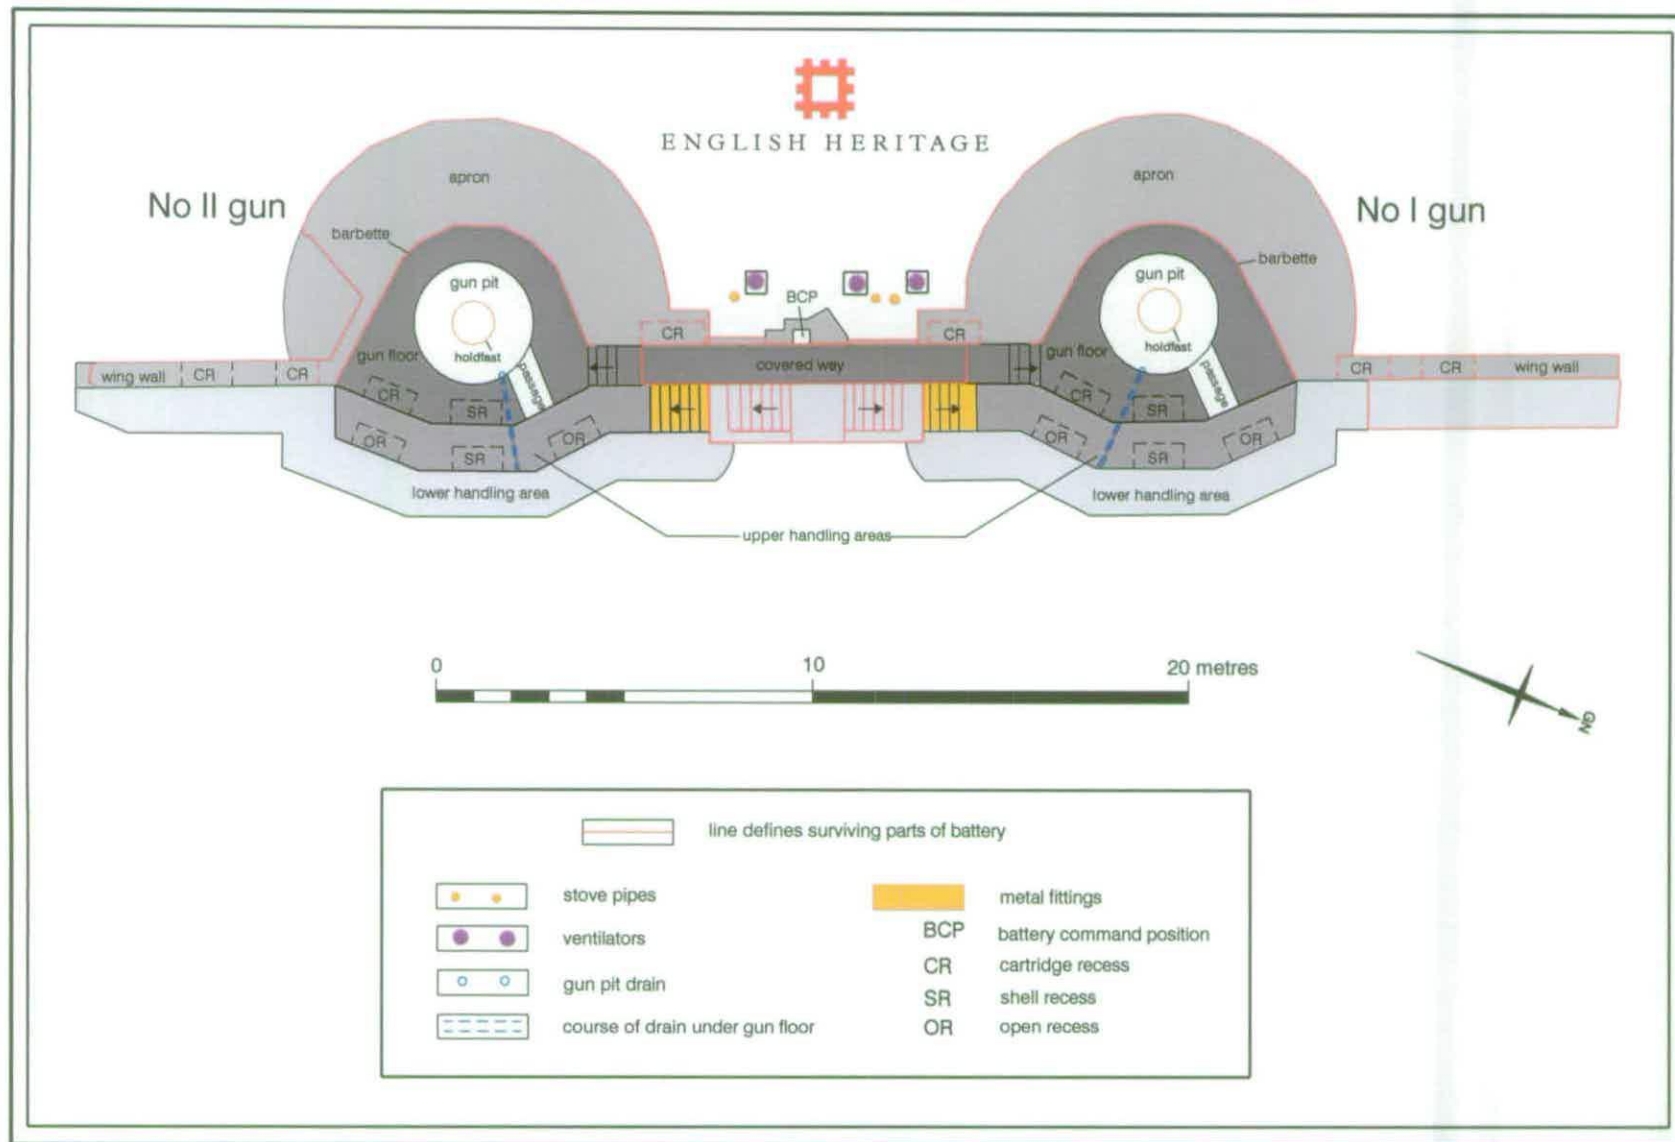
Detailed plan of the 4.7-inch battery at gun floor level (after PRO: WO 78-1392-2)
